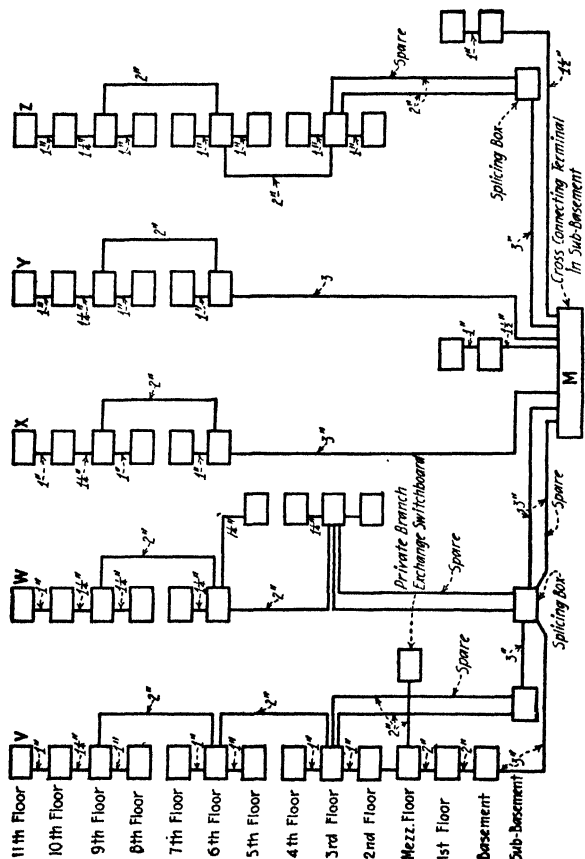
Conduit riser diagram of telephone conduits for a 11-story office building. See Fig. 640 for typical floor plan.
